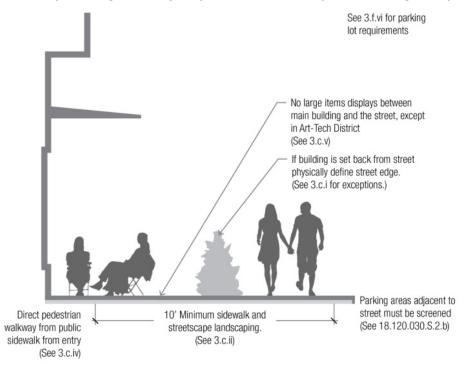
B.3.d. Requirements for building facades adjacent to Type C Streets. (This diagram is for illustrative purposes only. See Section 18-120-020.5 for stated requirements.)
